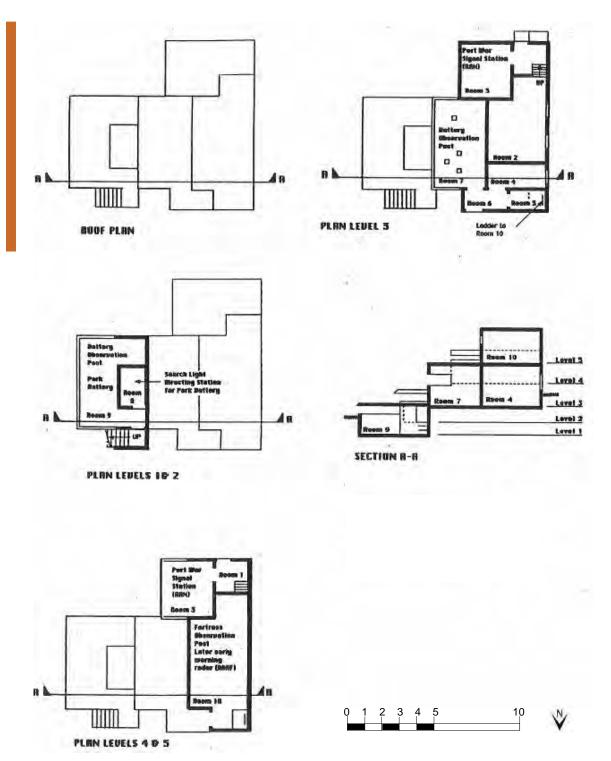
Plan for the Battery Observation Post dating from 1984. (Source: Shepherds Hill Cottage and Surrounds, Conservation Study, Gardner Browne, 1984)
